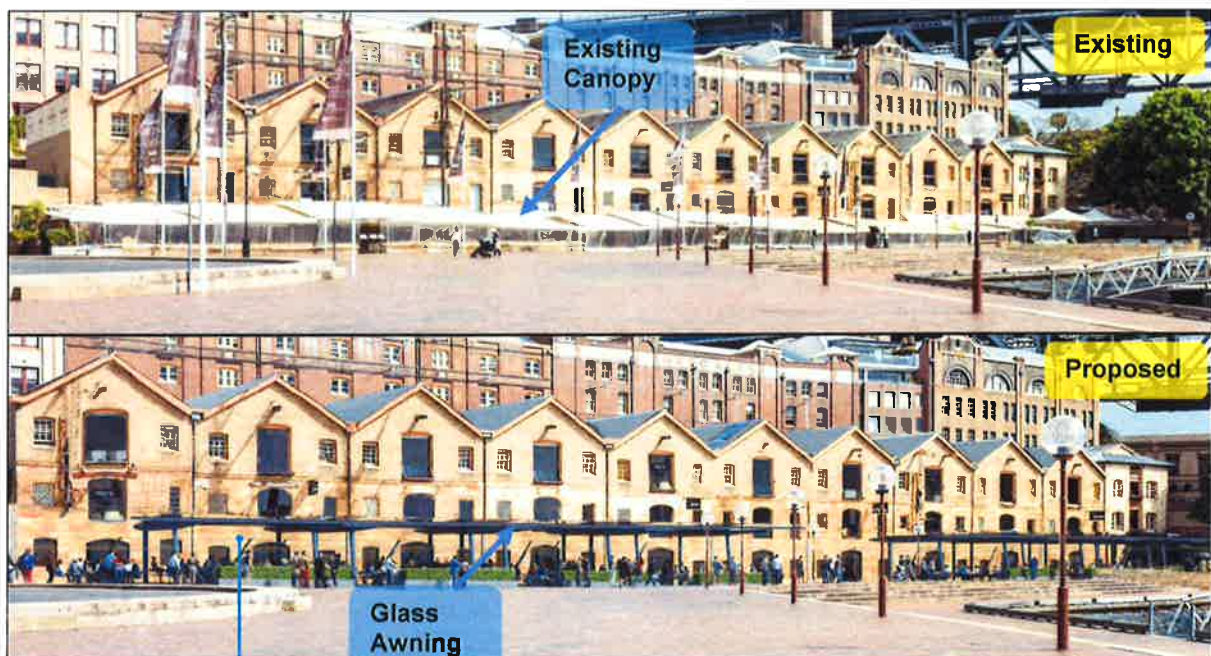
The proposed alterations to the outdoor dining area viewed from Campbell's Cove (Source: Applicant's EIS).
